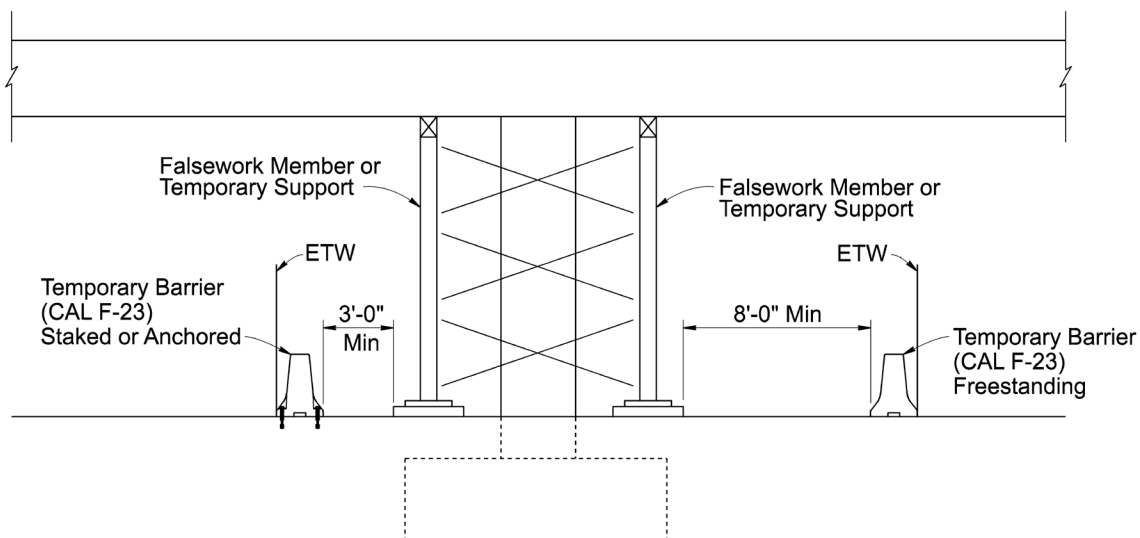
Illustration Using Temporary Concrete Barrier Cal F-23 near Falsework Member or Temporary Support
